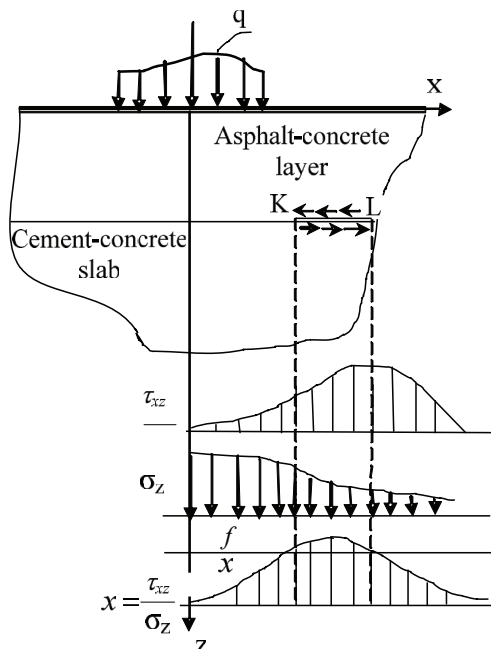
Schematic crack evolution between an asphalt-concrete layer and a cement-concrete slab
